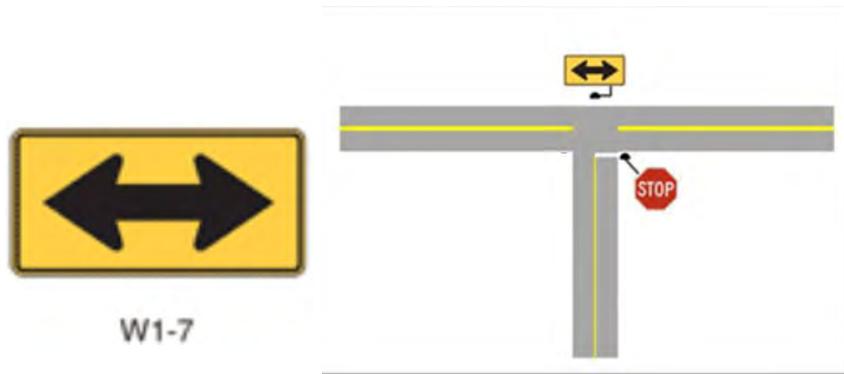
LARGE ARROW SIGN PLACEMENT AT T-INTERSECTIONS
